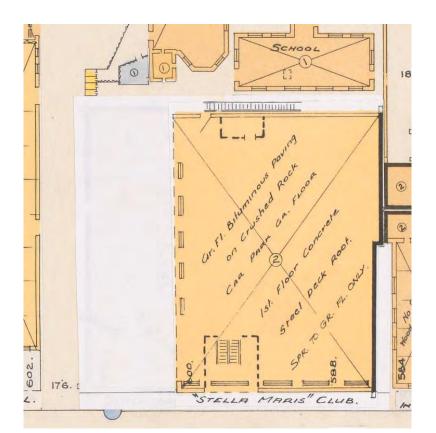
Detail of the Mahlstedt Fire Survey Plan showing the new club premises c1972. (Source: Mahlstedt Map section 1, no 23, 1948)
